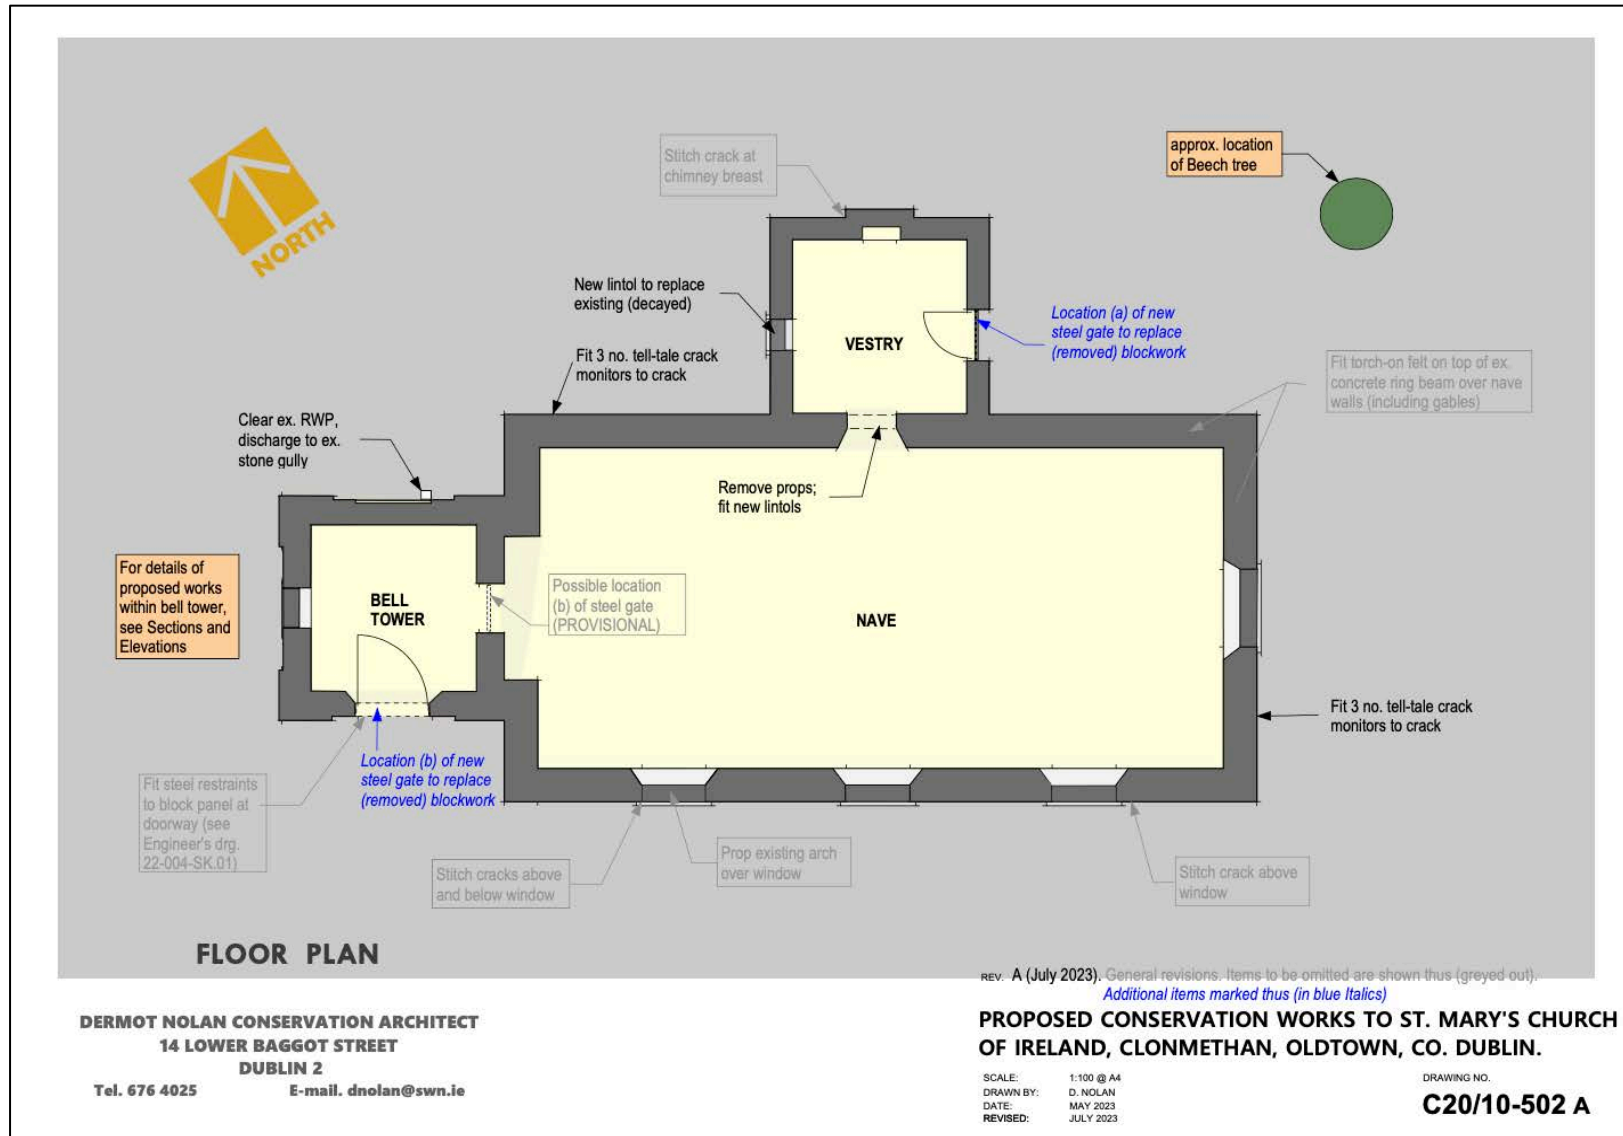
Floor plan of church with details of conservation interventions (Nolan 2023a).
